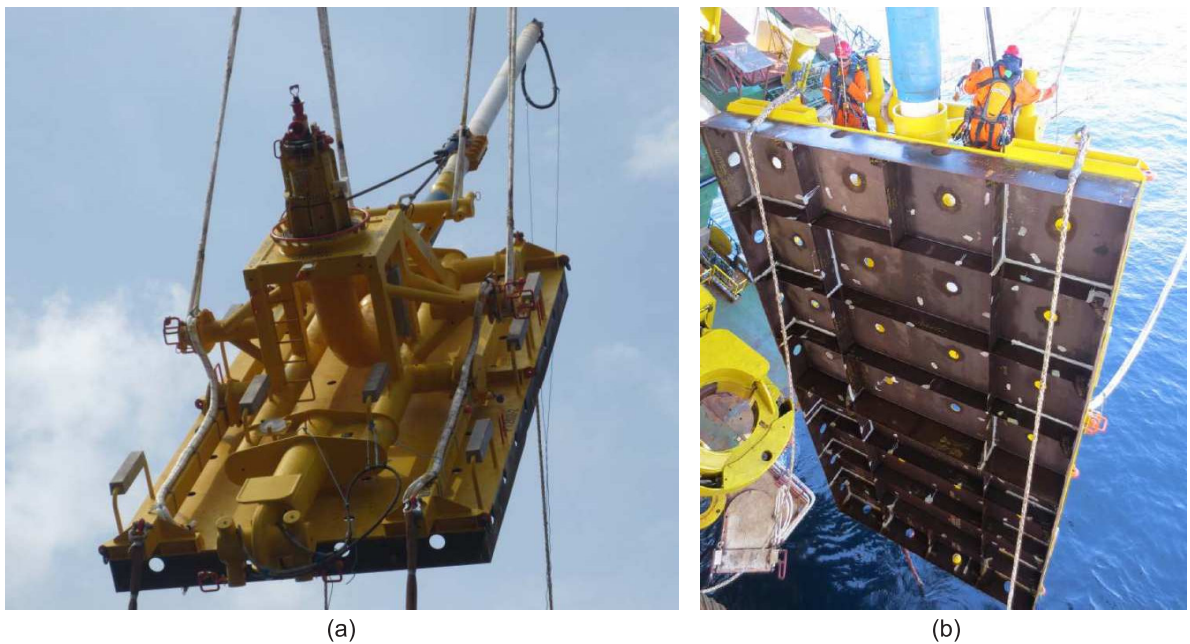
Rectangular mudmat foundation: (a) PLEM with mudmat foundation being hoisted before installation; (b) a view of the underbase skirts
